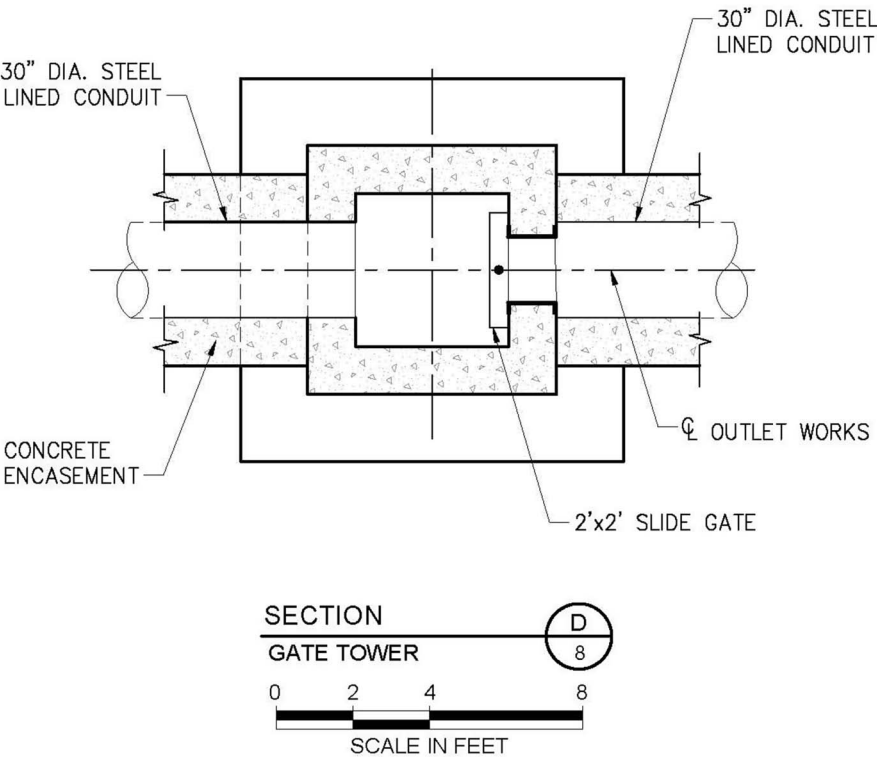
P-5. Section D Concrete Gate Tower, before Dimensioning
